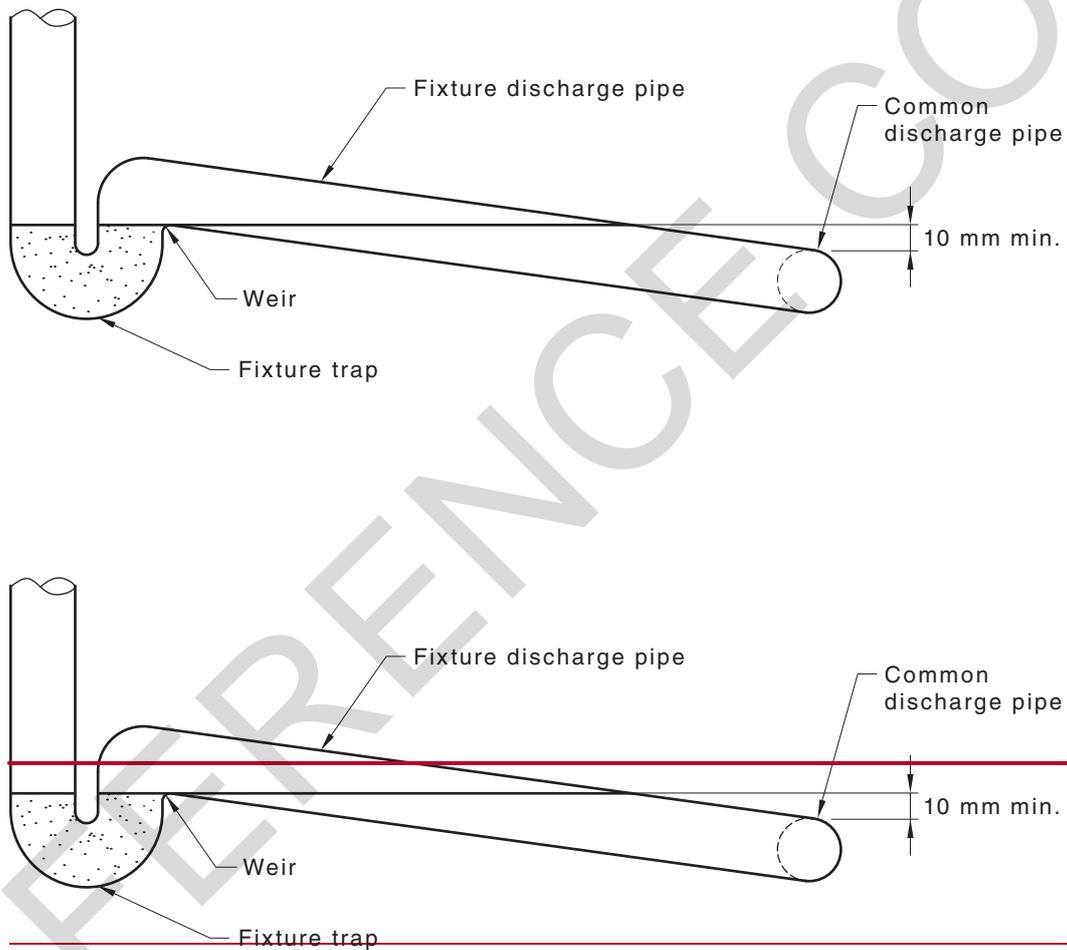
TYPICAL CONNECTION OF FIXTURE DISCHARGE PIPE TO A COMMON DISCHARGE PIPE
